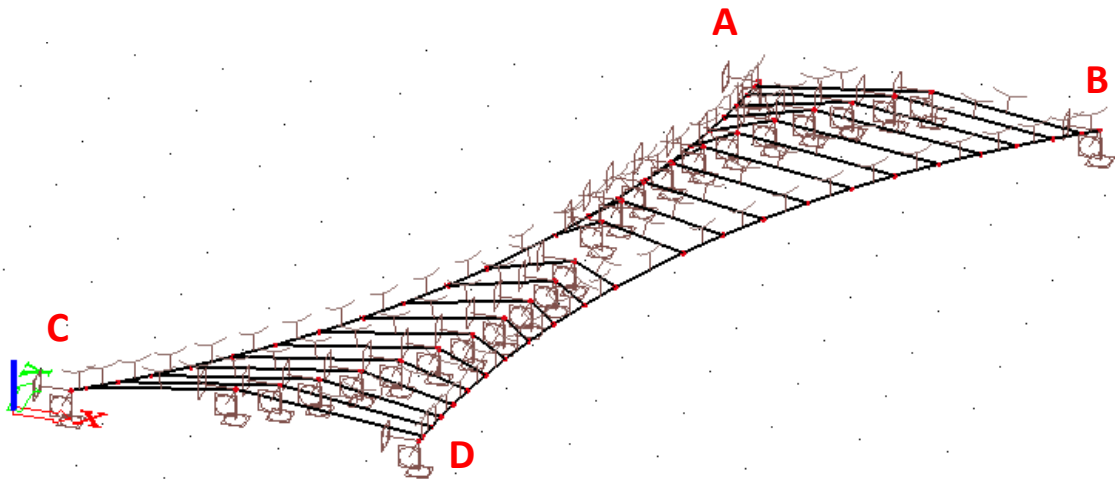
ANCHORING MODEL 1 IN SCIA ENGINEER
